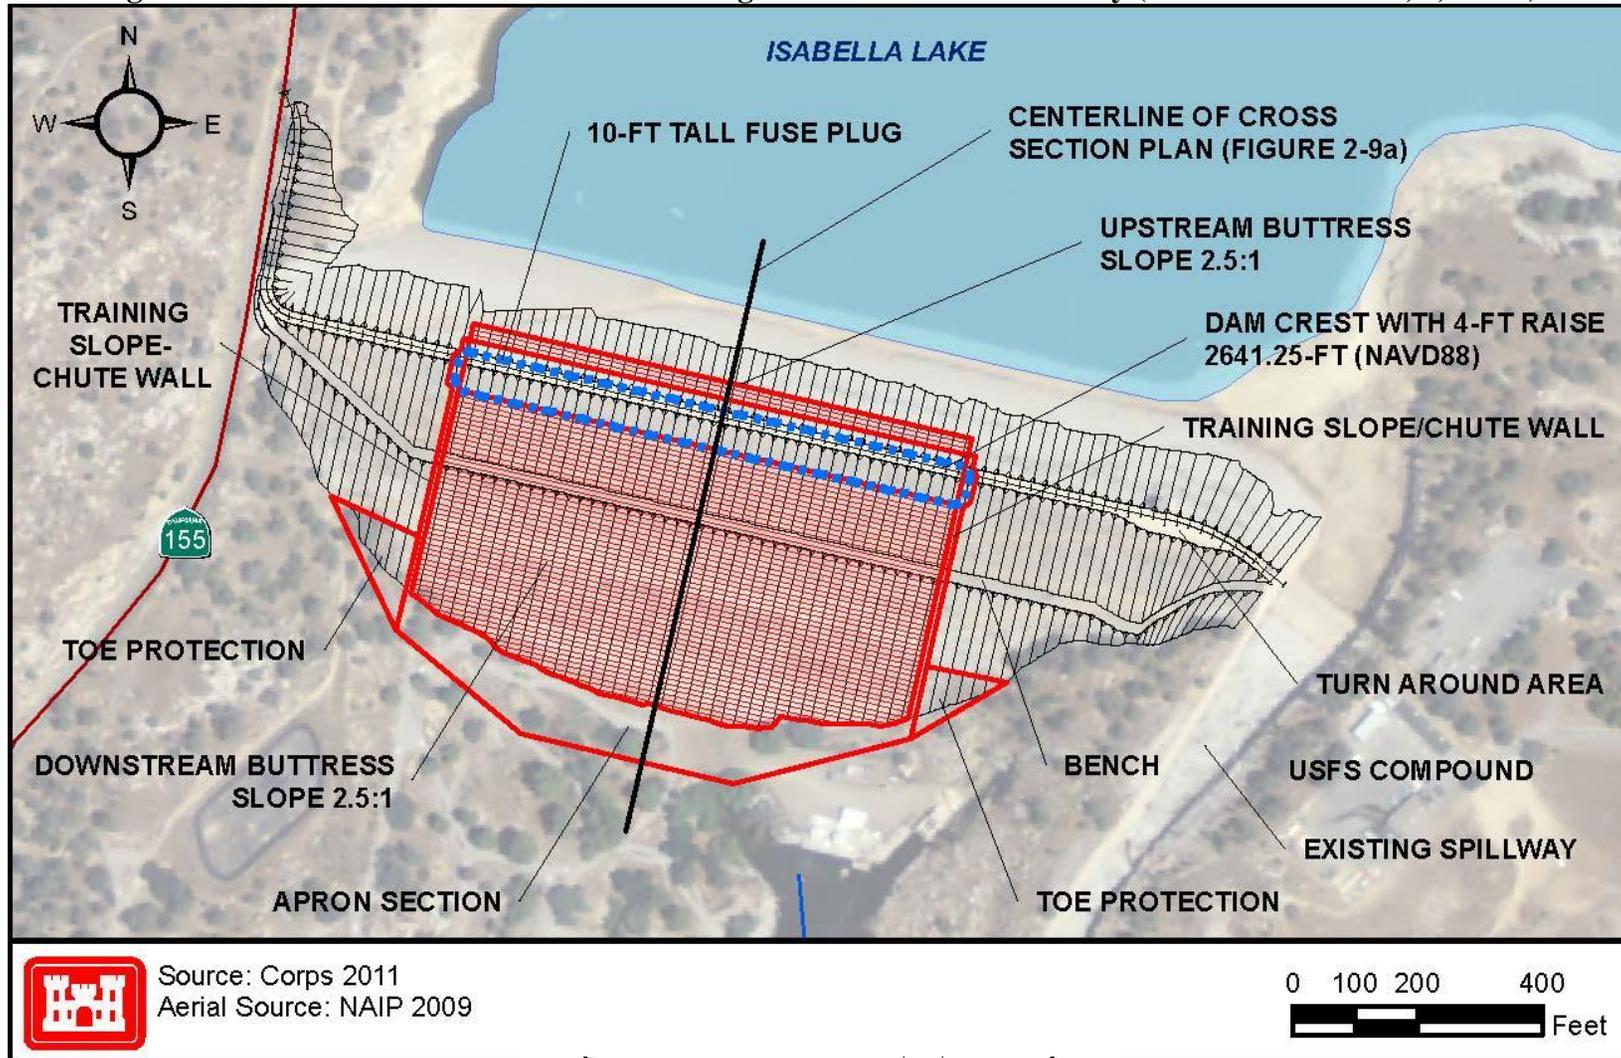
Plan View of Main Dam Full-Height Filter with RCC Overlay (Alternative Plans 1, 2, and 3)
